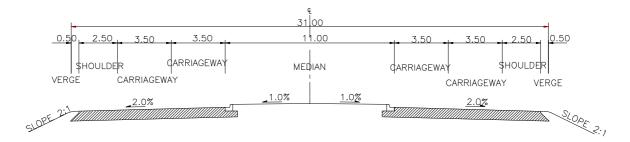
The Typical Cross-section of The Connecting Road in Thailand
